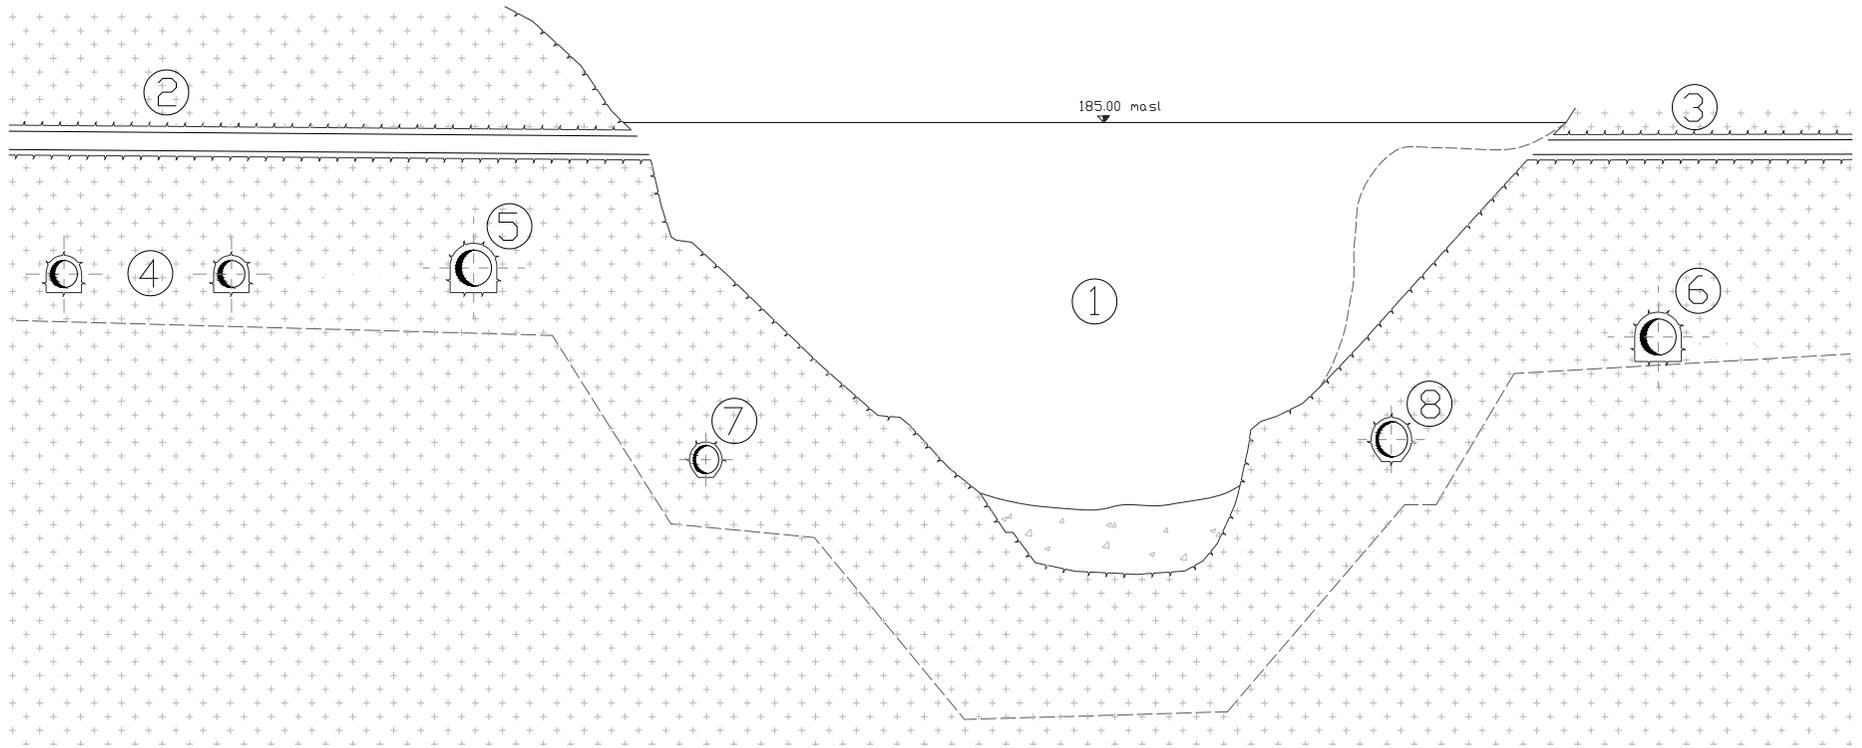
Longitudinal section of Koman Dam. ①: dam, ②: gallery, ③: gallery, ④: power waterway, ⑤: tunnel spillway No. 4, ⑥: tunnel spillway No. 3, ⑦: diversion tunnel No. 2, ⑧: diversion tunnel No. 1.
